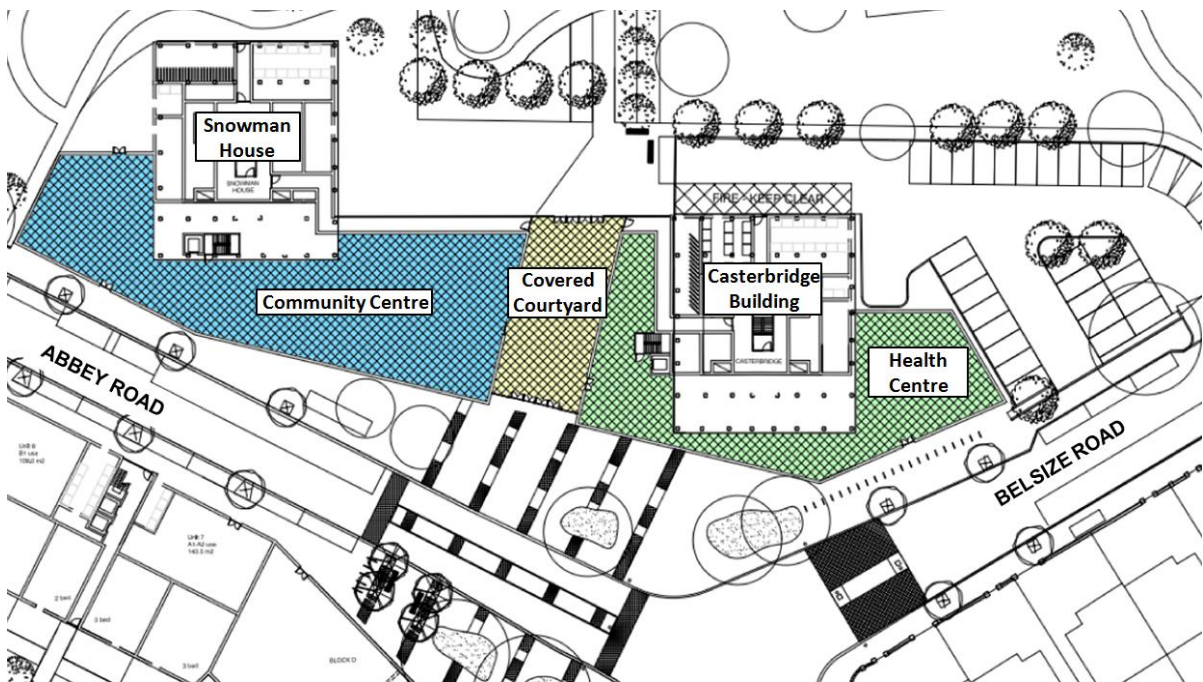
Plan view of the Abbey road Phase 2 regeneration.
